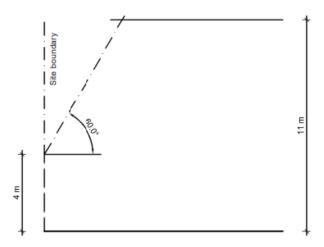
Building height in Sub-Precinct A and B
